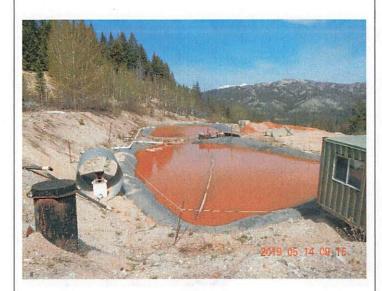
(DSCN1724) Description: Facing northwest, photo of Pond #1 (North Pond) and Pond #2 (South Pond).
